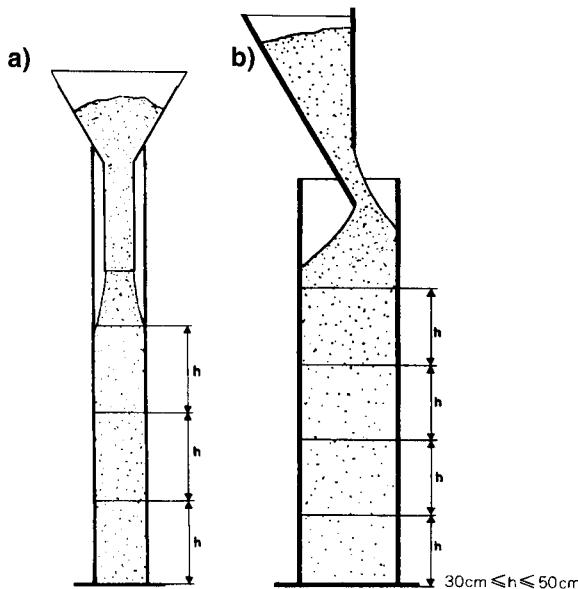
Gravity filling with concrete mix by means of a) funnel b) bottom emptying hopper
